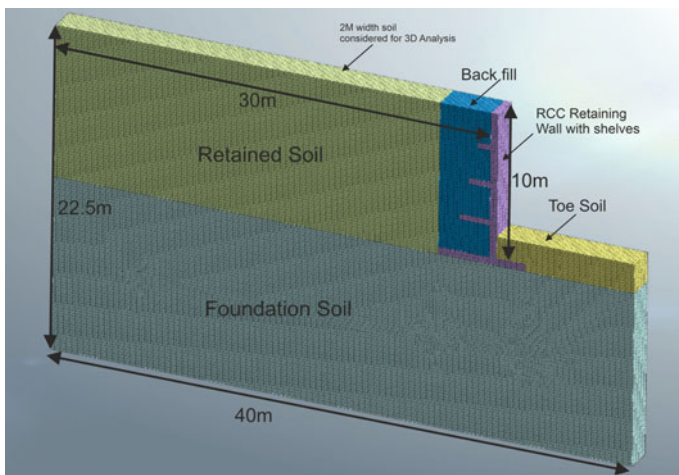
FEM model of retaining wall with pressure relieving shelves
